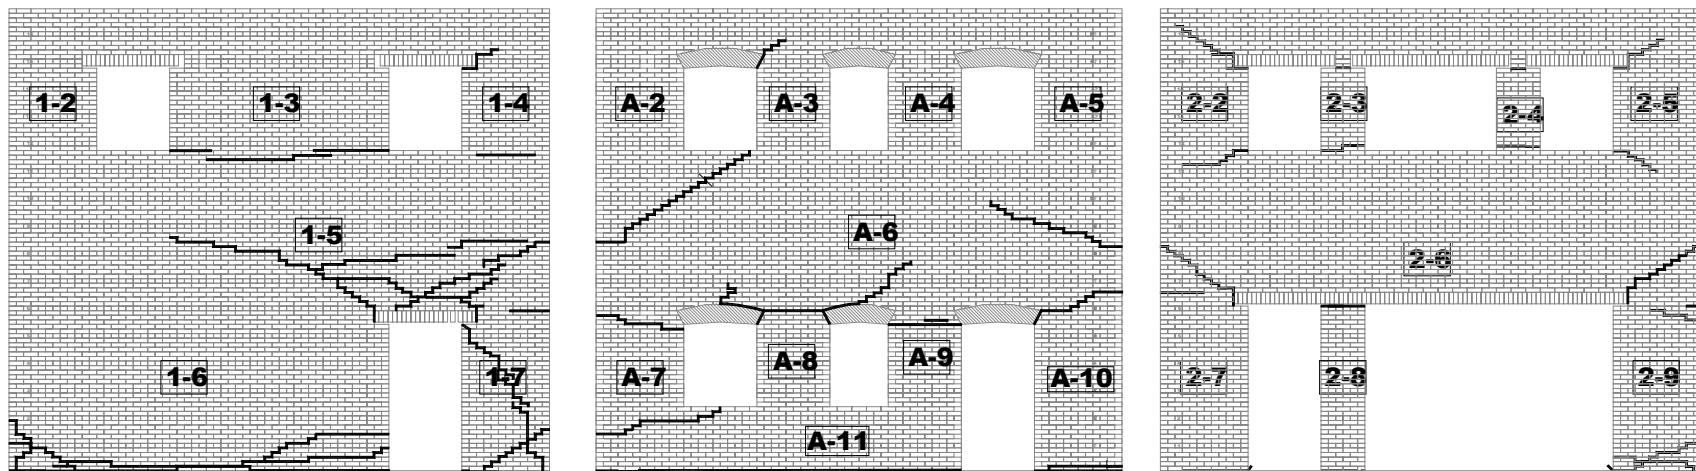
Initial cracks in Wall A and adjacent Wall 1 (left) and Wall 2 (right). Number IDs of each pier are given in the rectangles.
